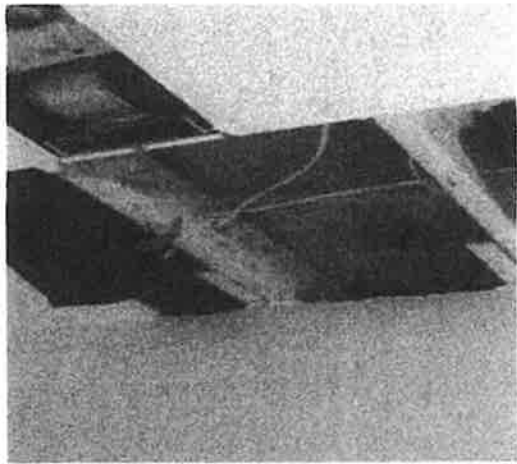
Ceiling/Roof joists 2 x 8" at 16" OC - Third Floor
